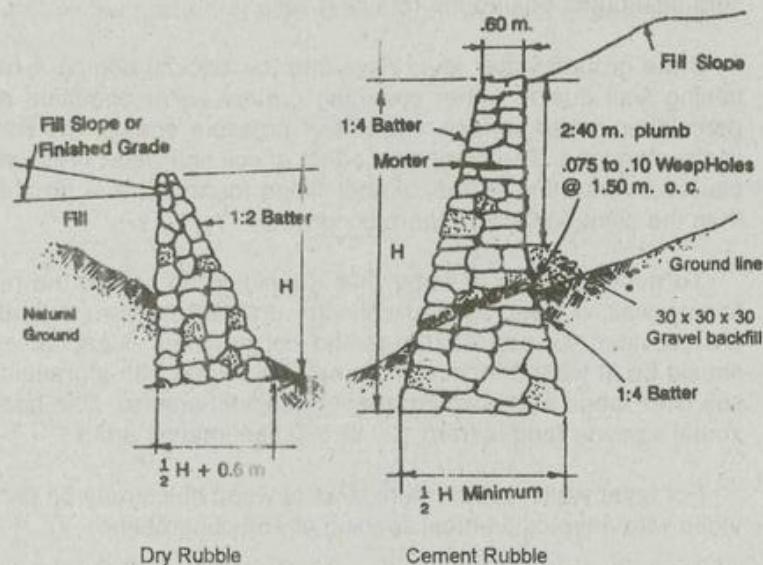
CROSS SECTION OF RUBBLE RETAINING WALL
